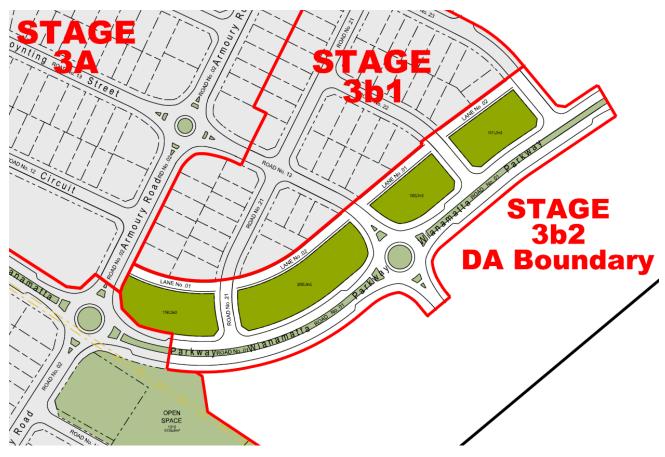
The Proposed Stage 3B2 Subdivision Layout
